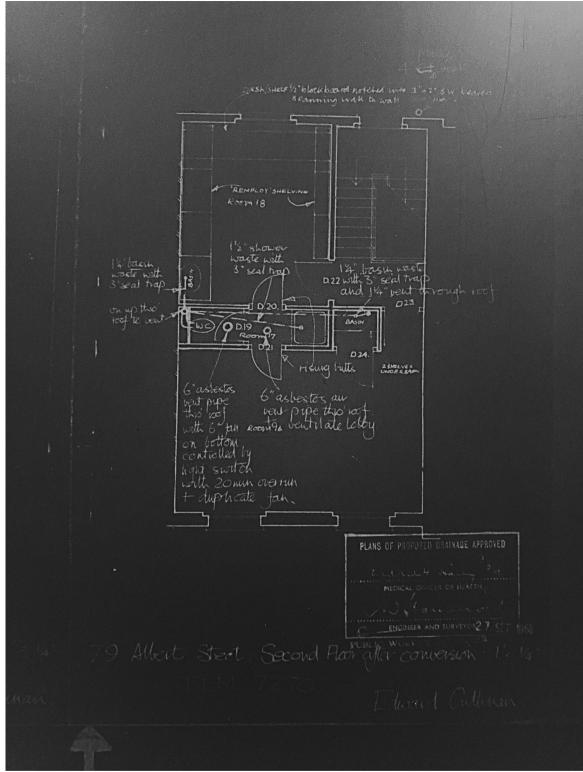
An extract of a 1968 proposed drawing of the second floor of 79 Albert Street.
